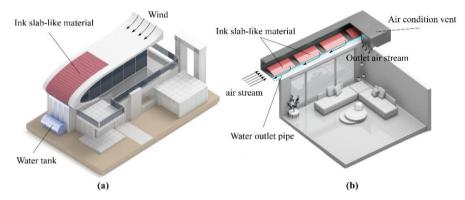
(a) Exterior roof platform made of ink slab-like materials, (b) interior ink slab-like material usage in air condition vent
